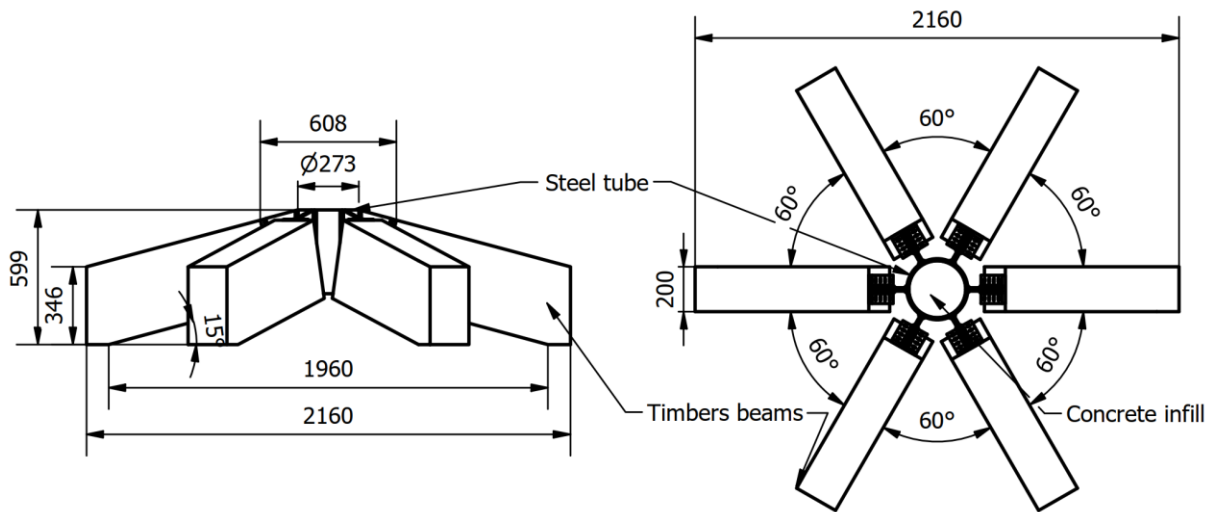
Test specimen dimensions in mm (left: front view; right: top view).
